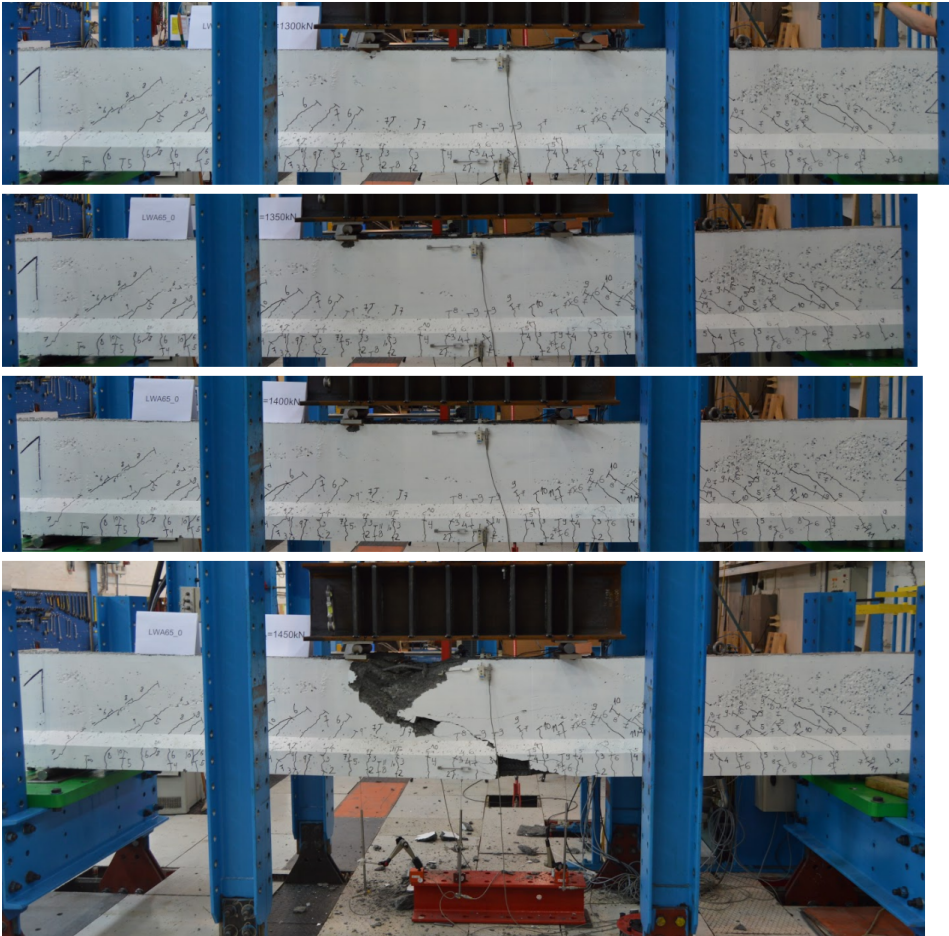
Beam 1 - Setup 2 - Load steps with drawn crack development.
